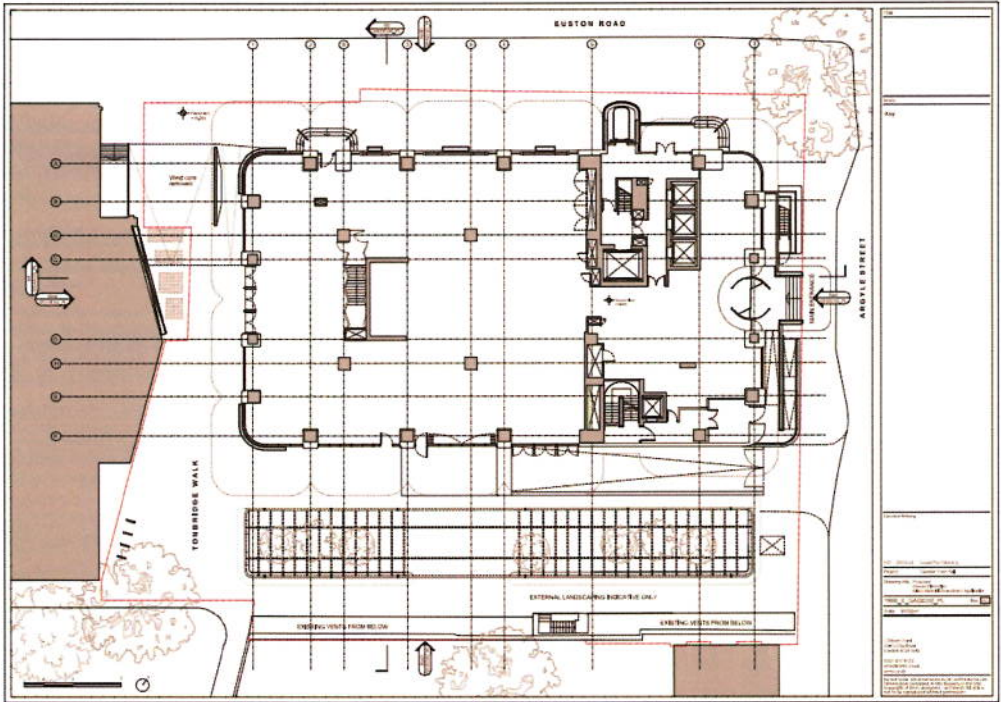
Approved Floorplan showing the hotel rooms in relation to the Camden Centre (Ref: 2016/0410/P)
